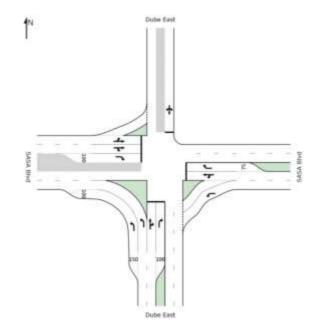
Future layout of the Dube East / SASA Boulevard Intersection
